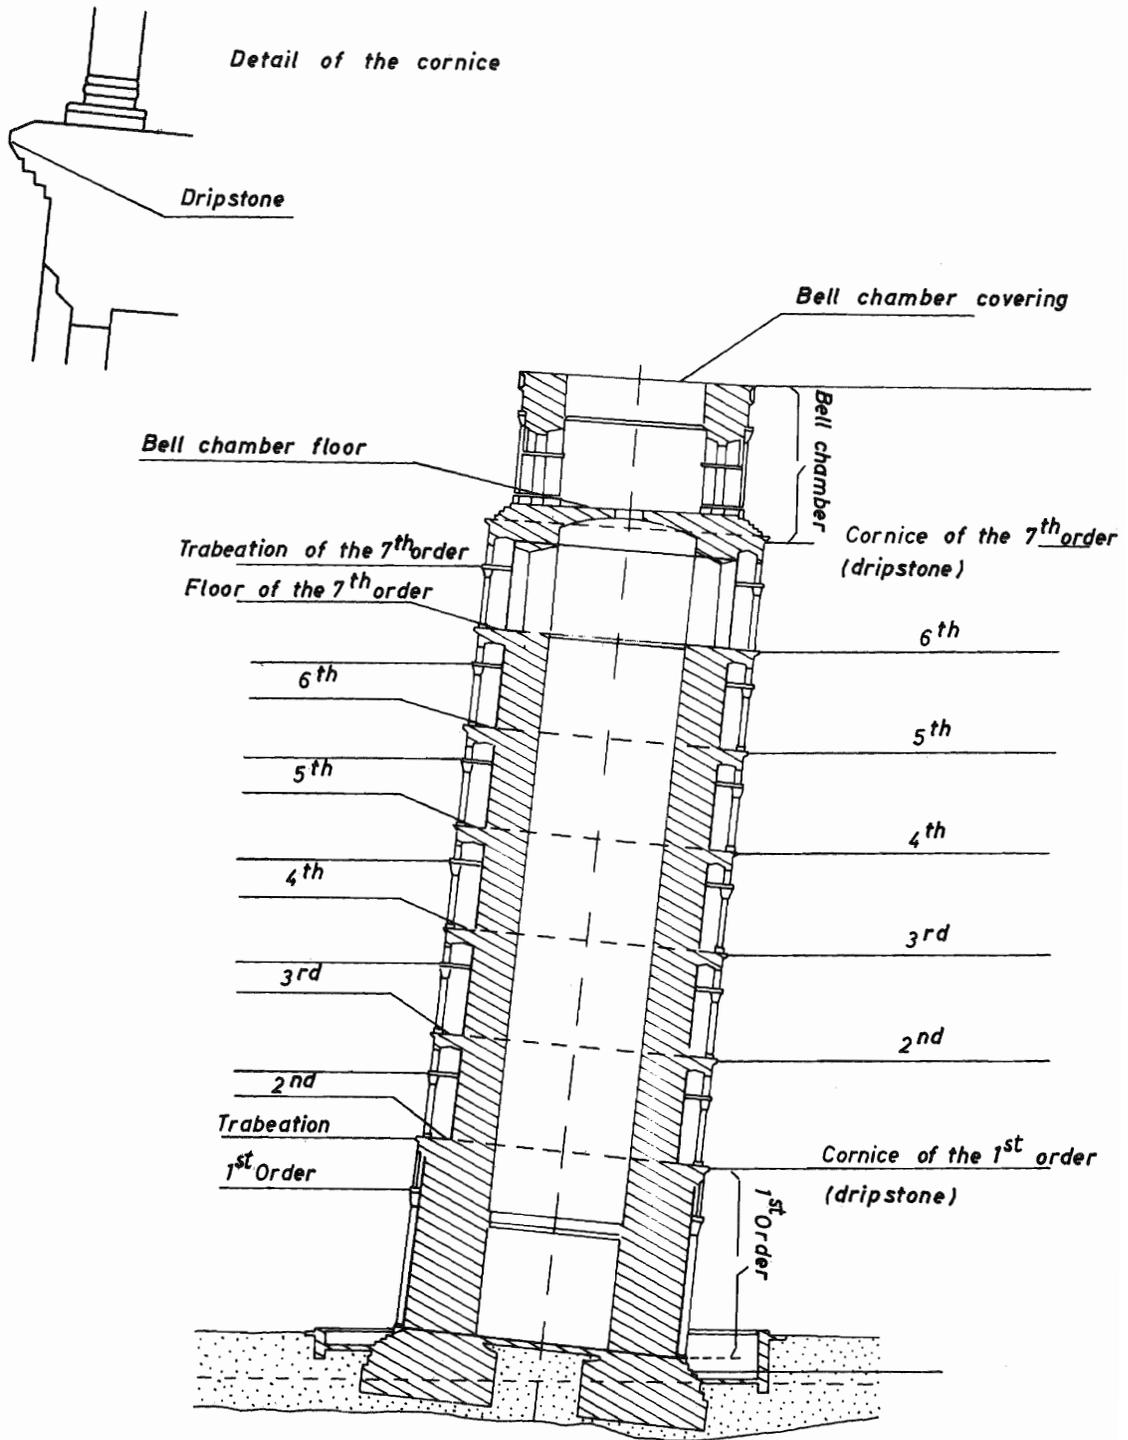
Schematic Cross-Section of the Tower and Terminology
